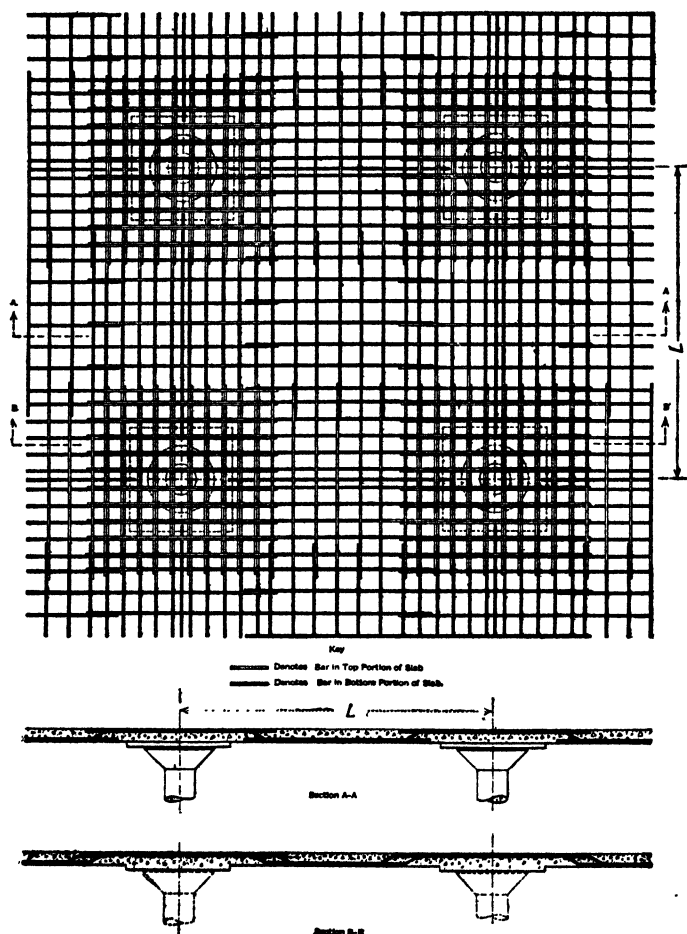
Two-way Flat Slab Construction. Typical Interior Panel
